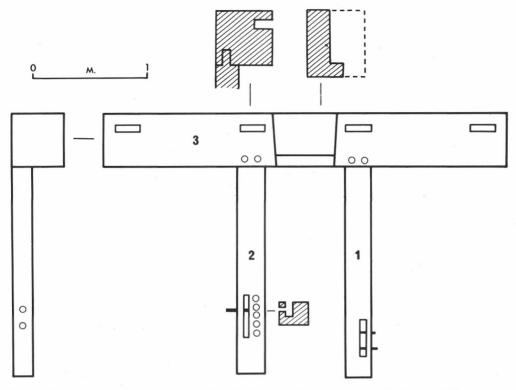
The wooden structure at Springs Bridge, Bradbourne: plan and sections of the timbers. The numbers designate the three timbers examined.
